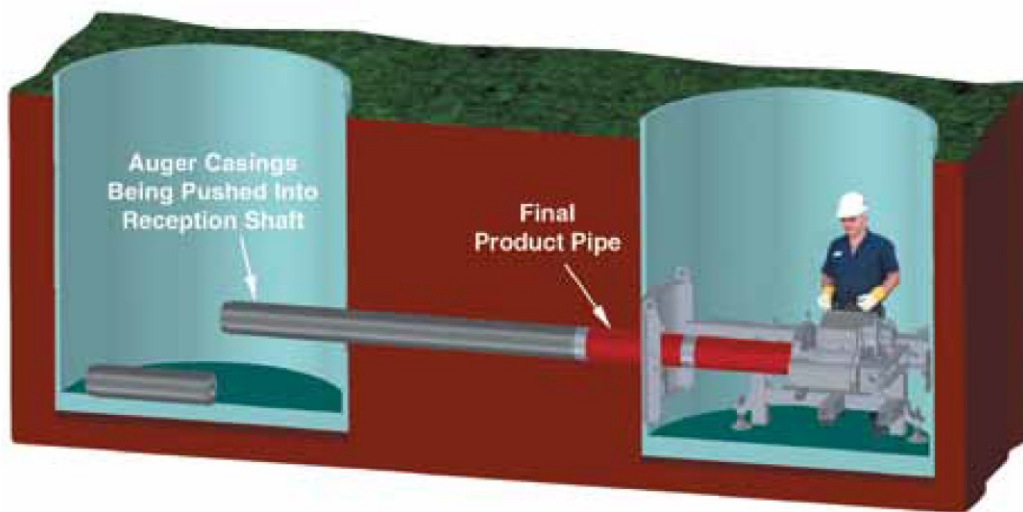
Final product pipe installation (Akkerman, 2013)
